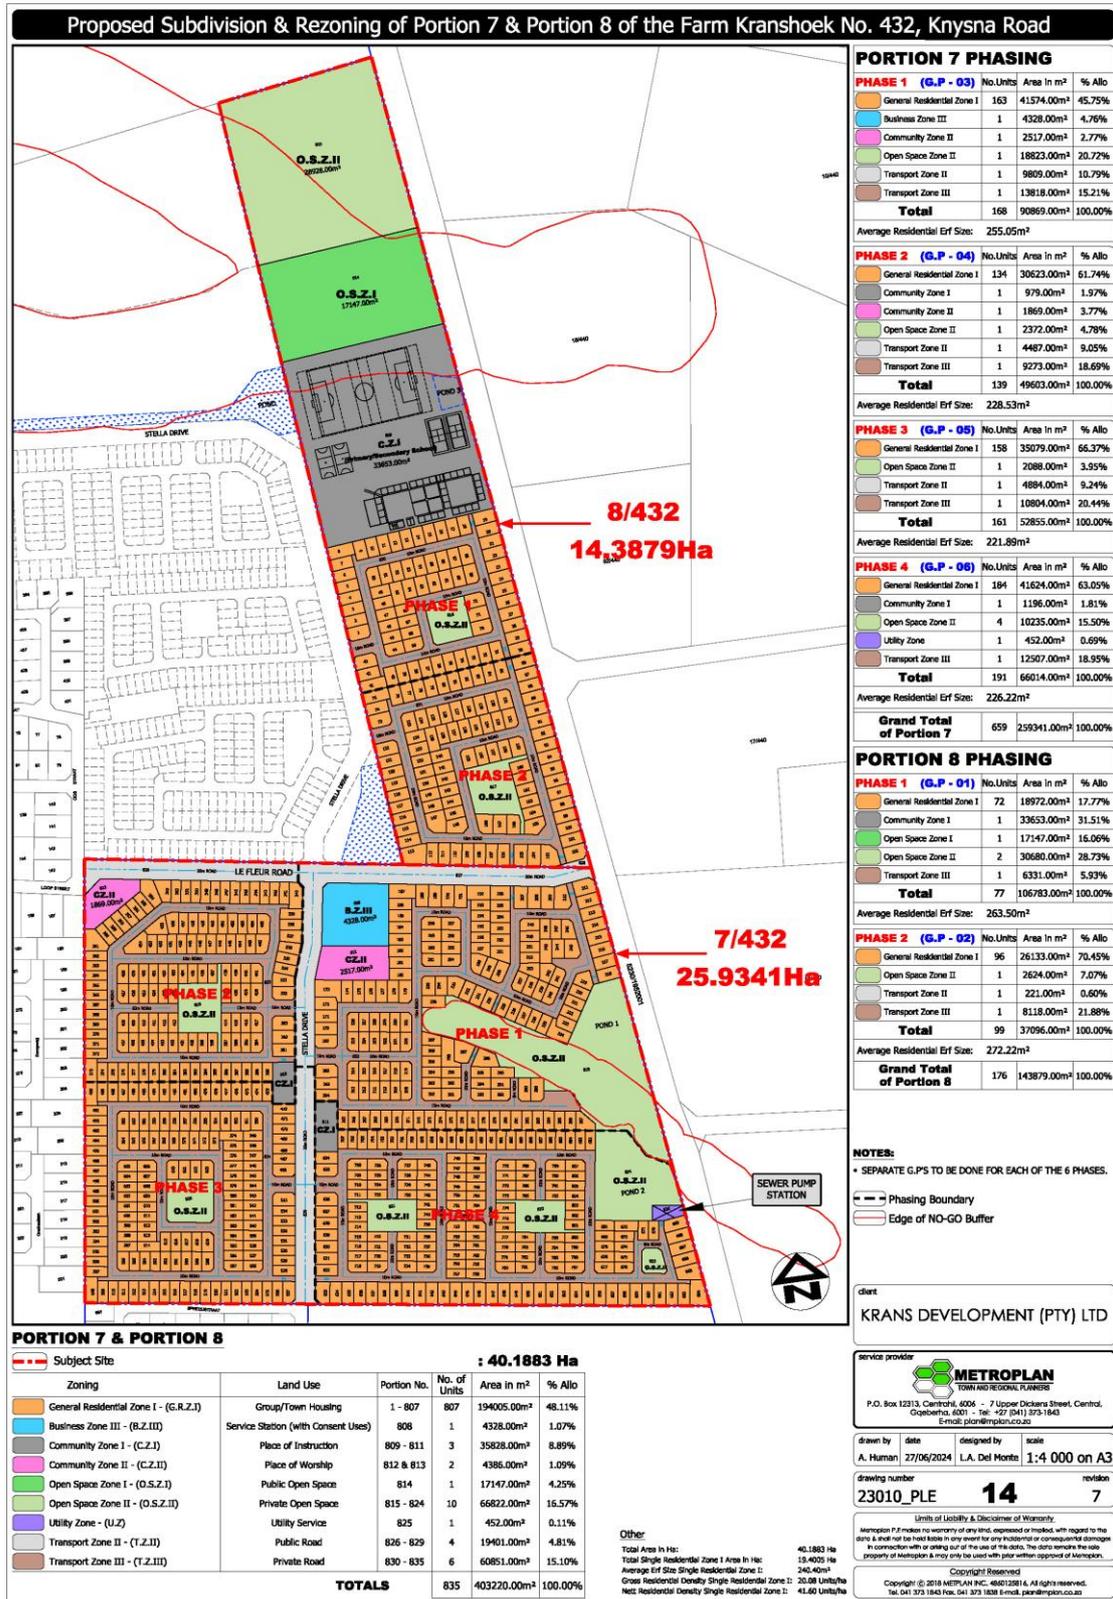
Proposed Mixed Use housing development layout plan (Map 23010_PLE Rev 7).
